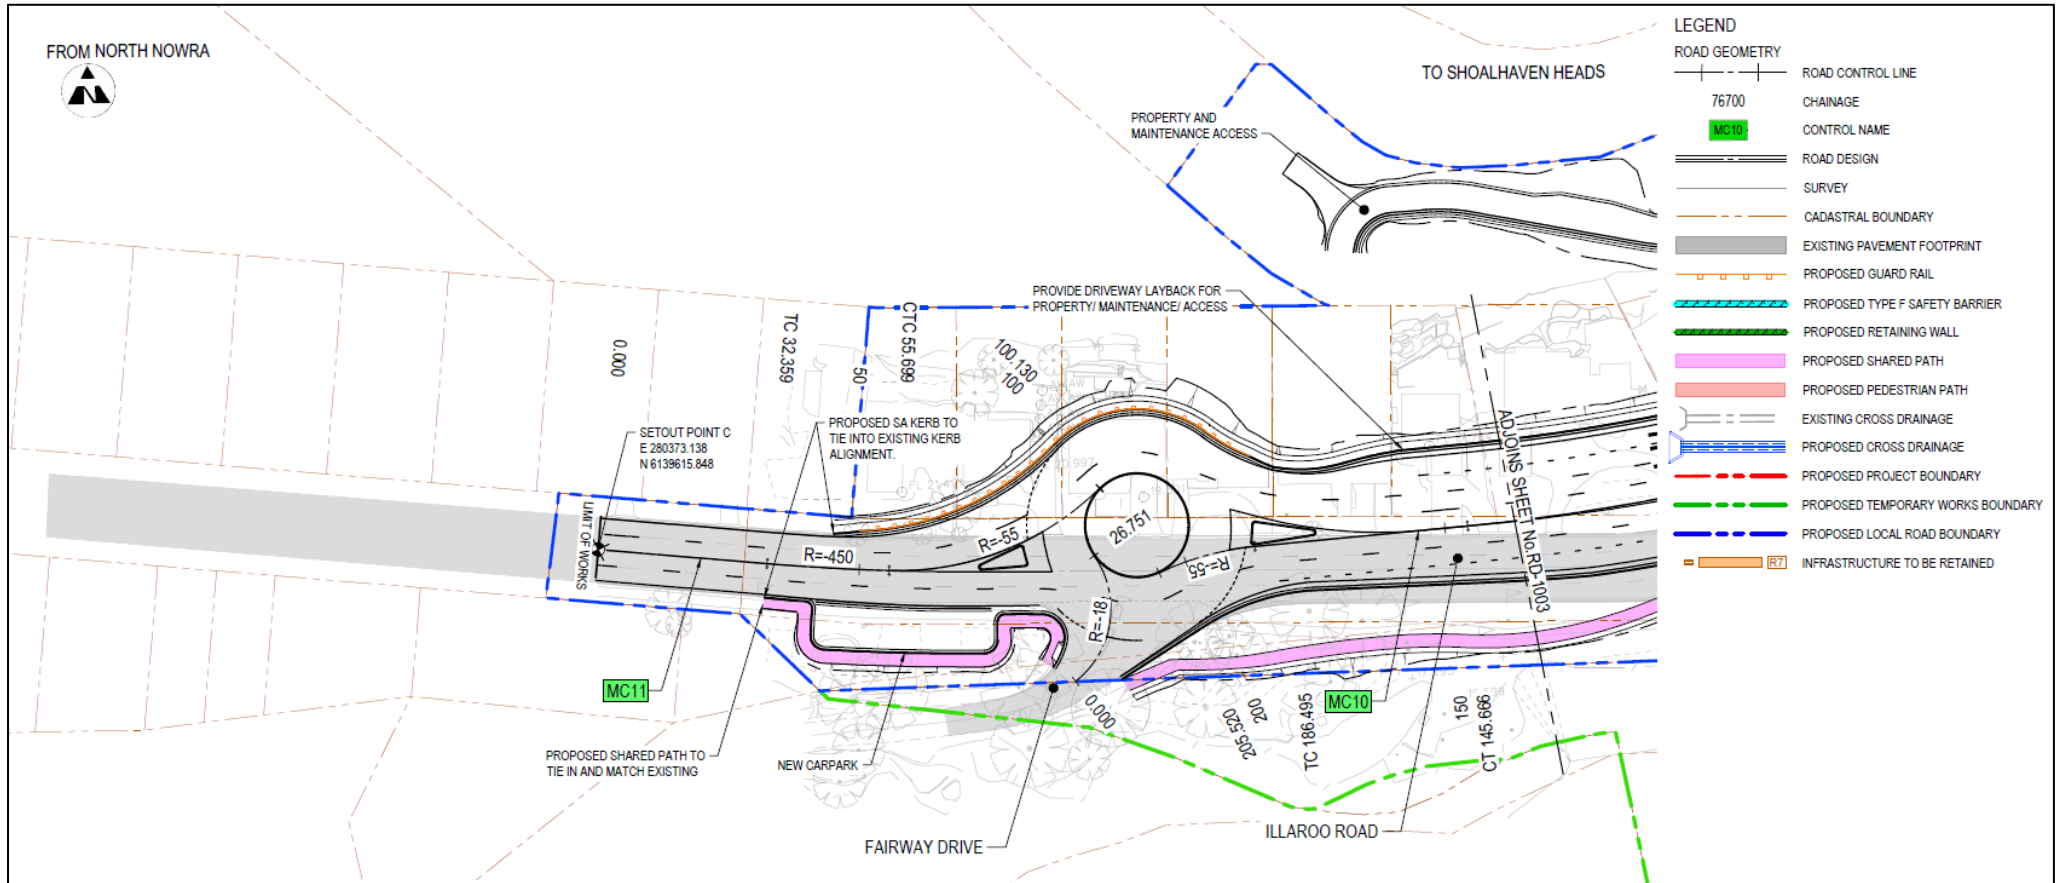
The Fairway Drive roundabout works (not to scale) (Source: Fulton Hogan, 2020).
